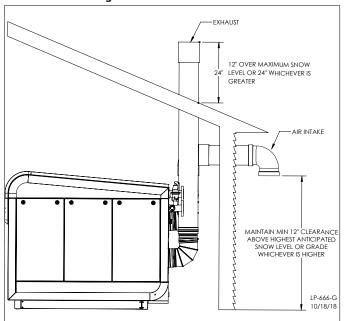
Unbalanced Venting - Roof Exhaust and Sidewall Intake
